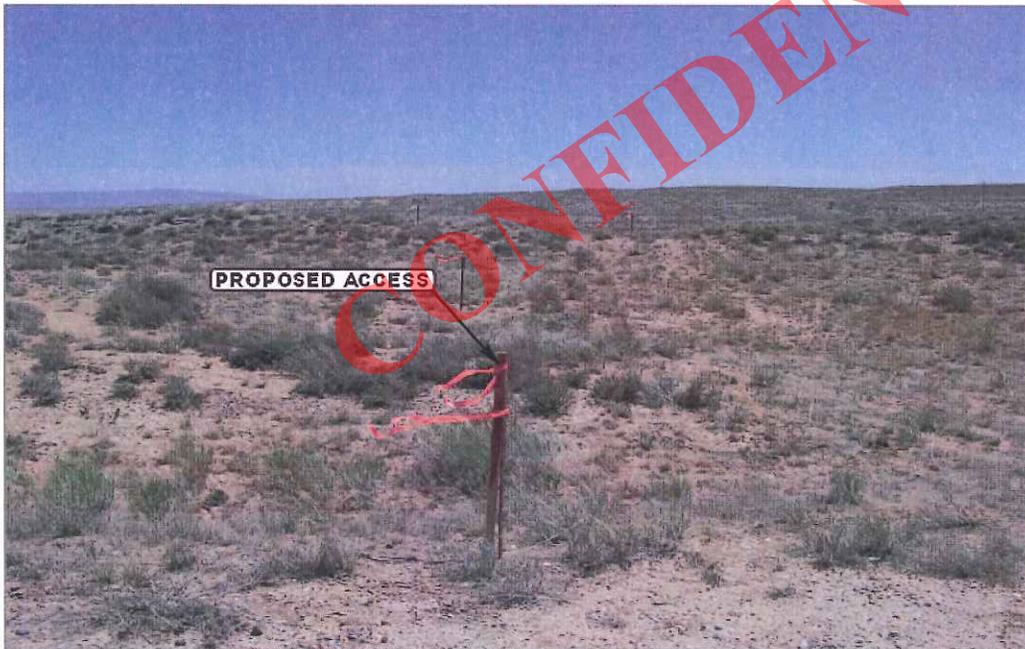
PHOTO: VIEW FROM BEGINNING OF PROPOSED ACCESS
